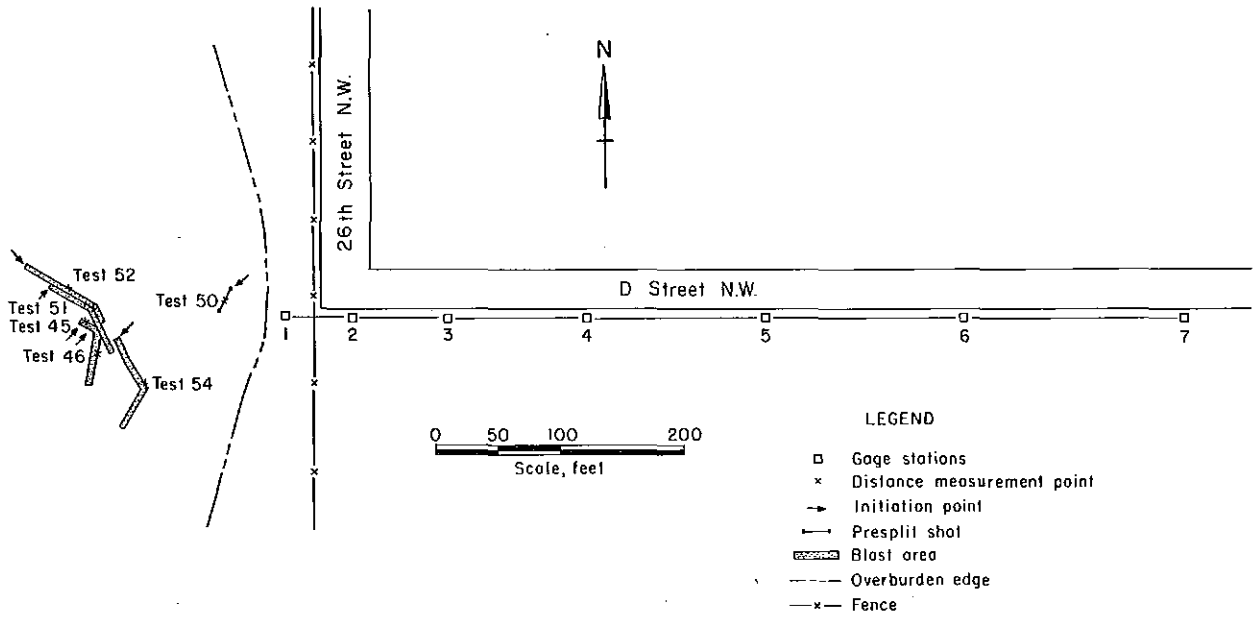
Plan View of Washington, D.C., Test Site.
